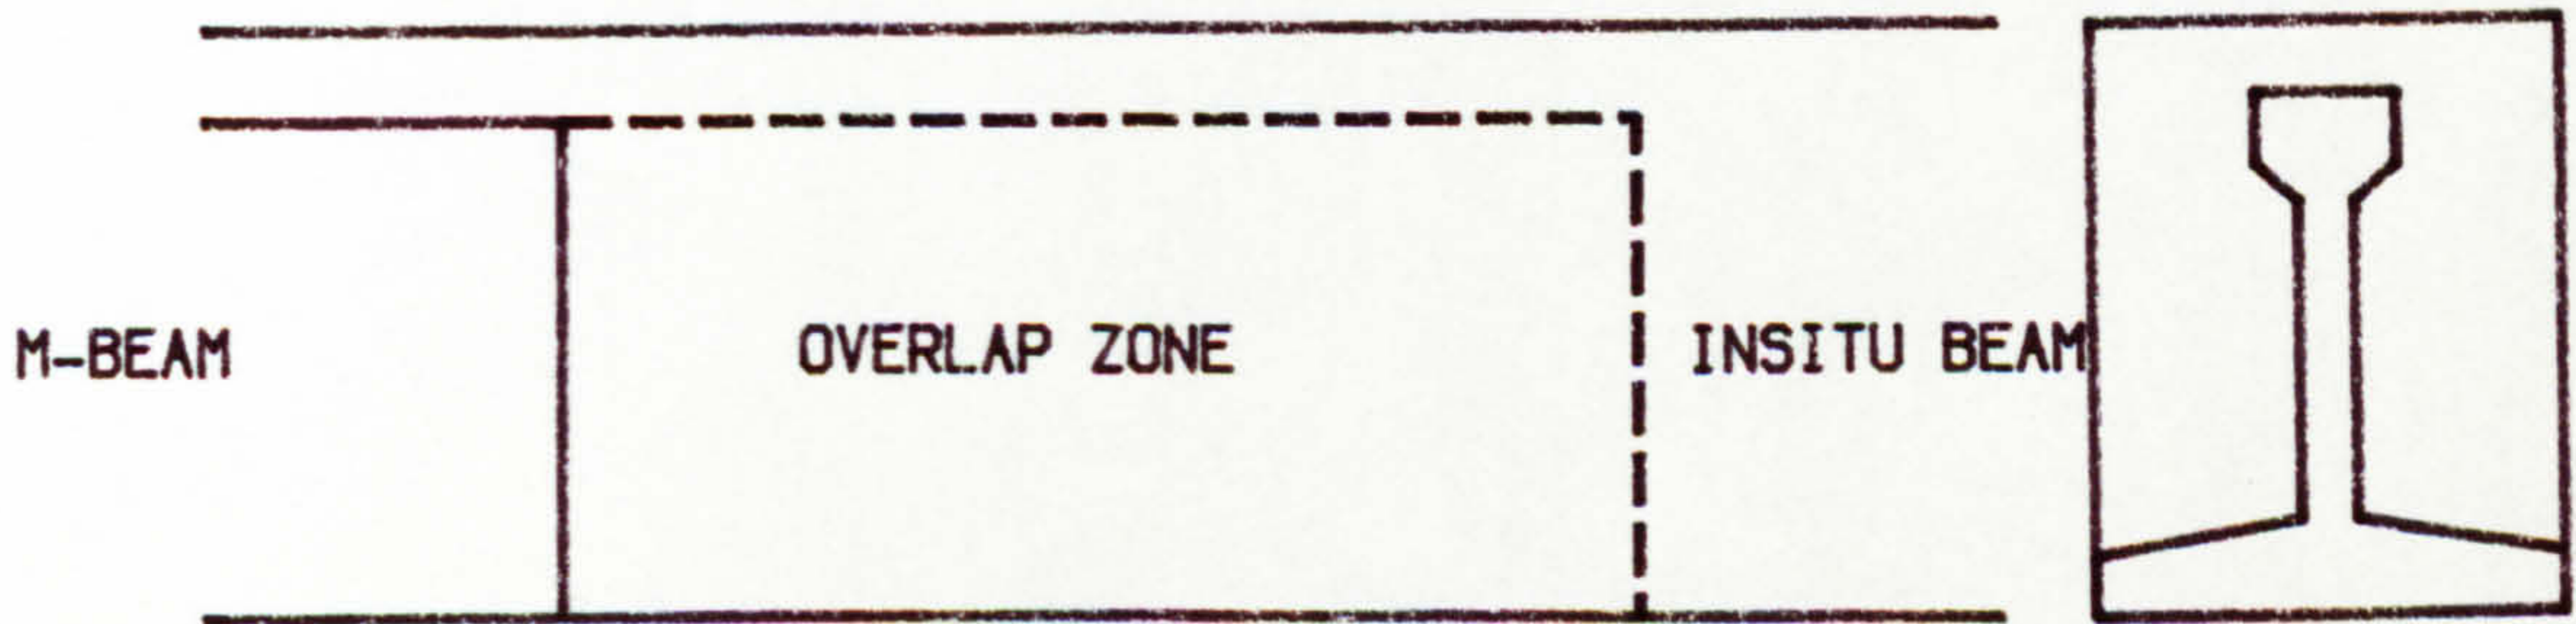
20 VERTICAL SEPARATION BETWEEN PRECAST BEAM AND IN-SITU NIB
